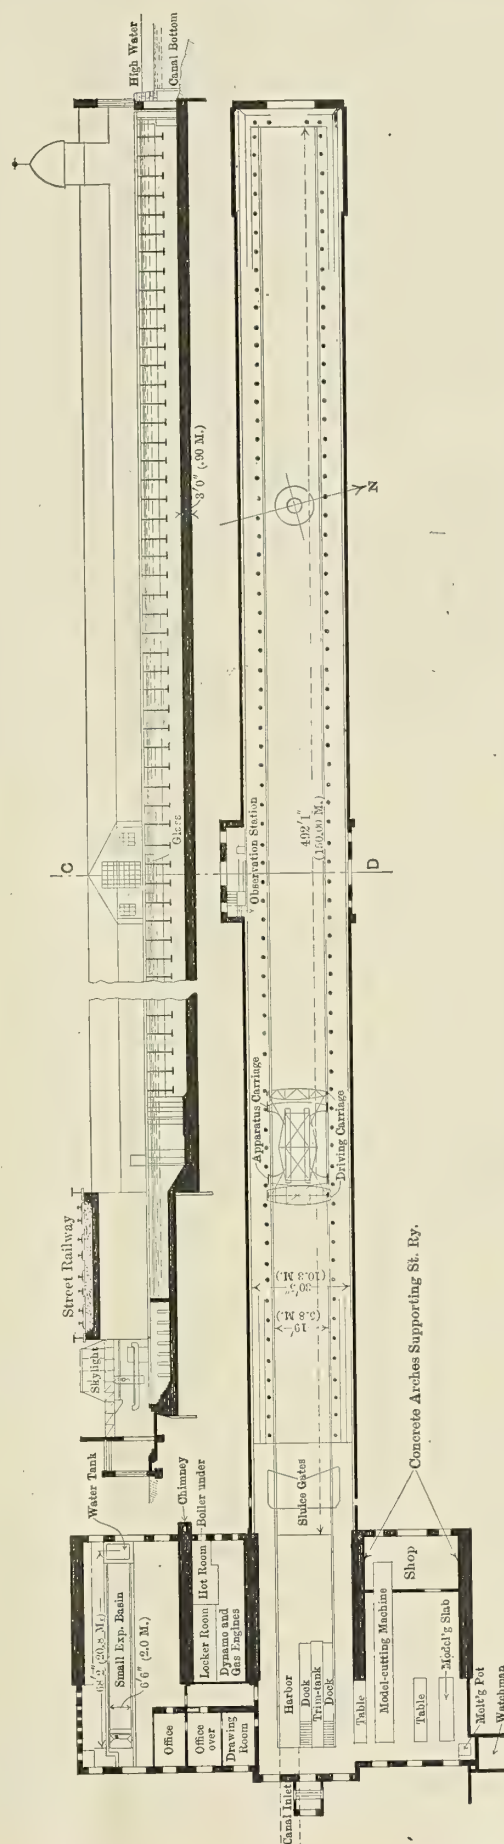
PLAN AND ELEVATION OF THE EXPERIMENTAL MODEL TOWING BASIN AT CHARLOTTENBURG.
